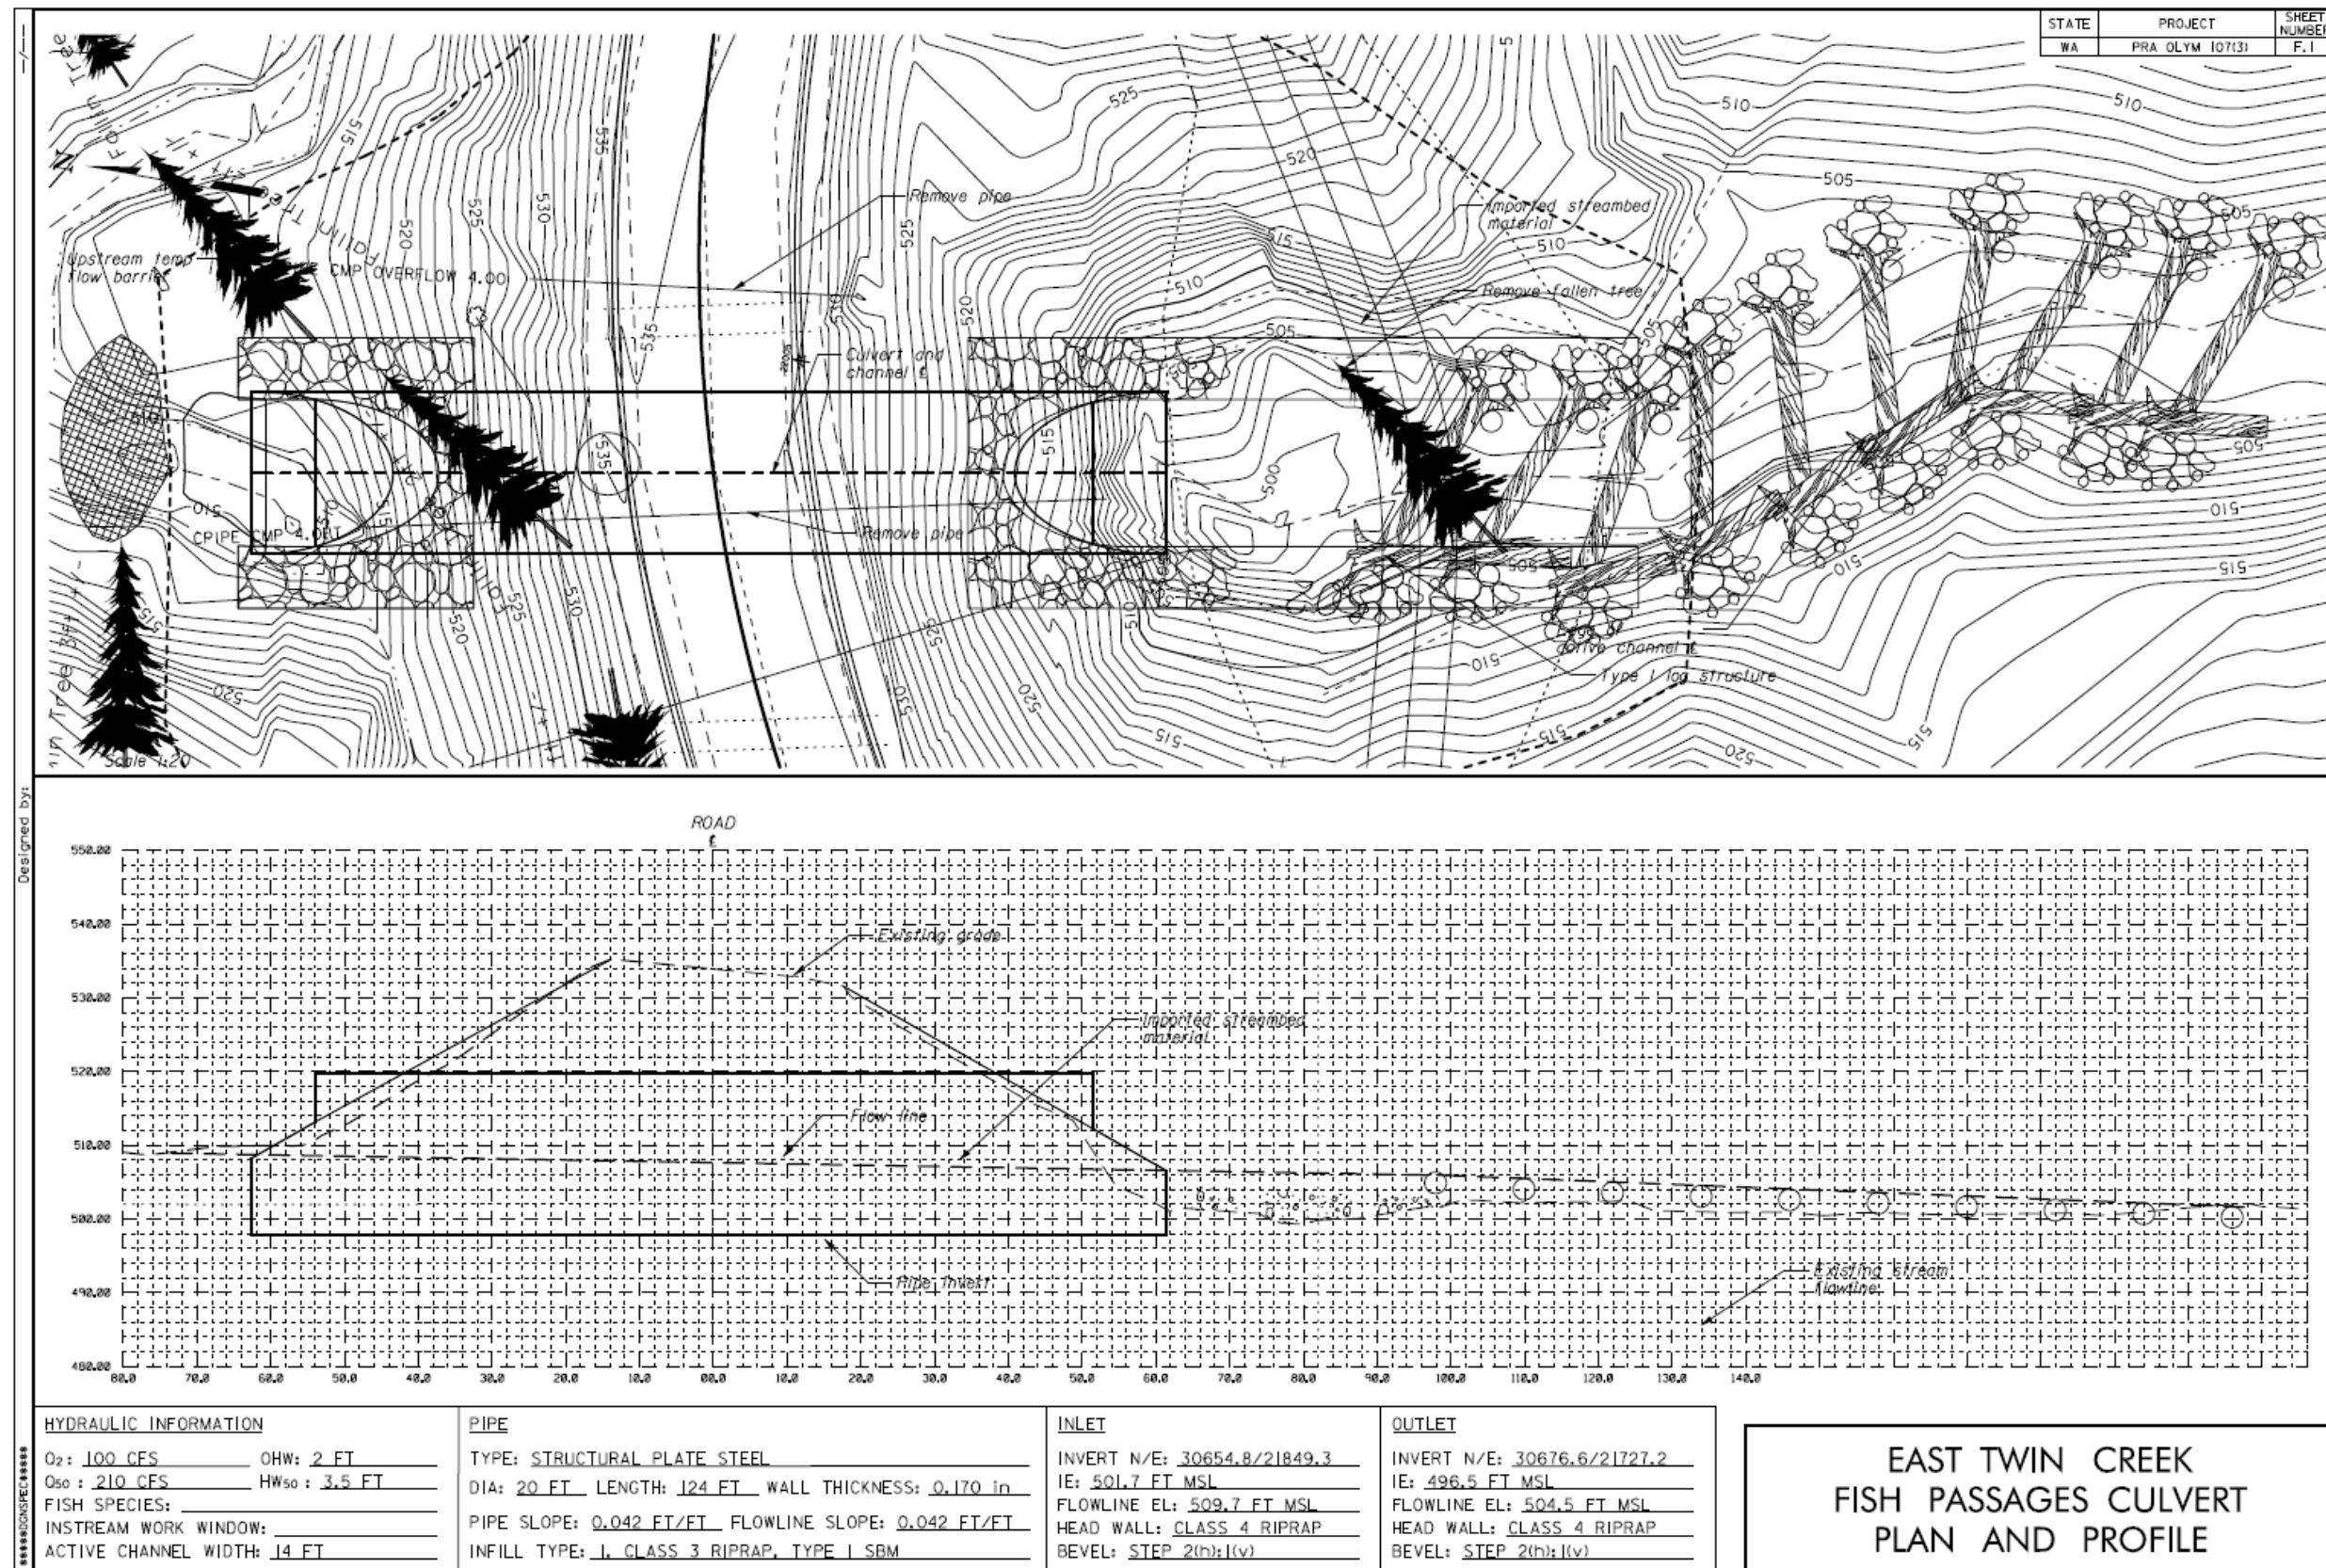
East Twin Creek AOP Culvert – Plan and profile sheet.
